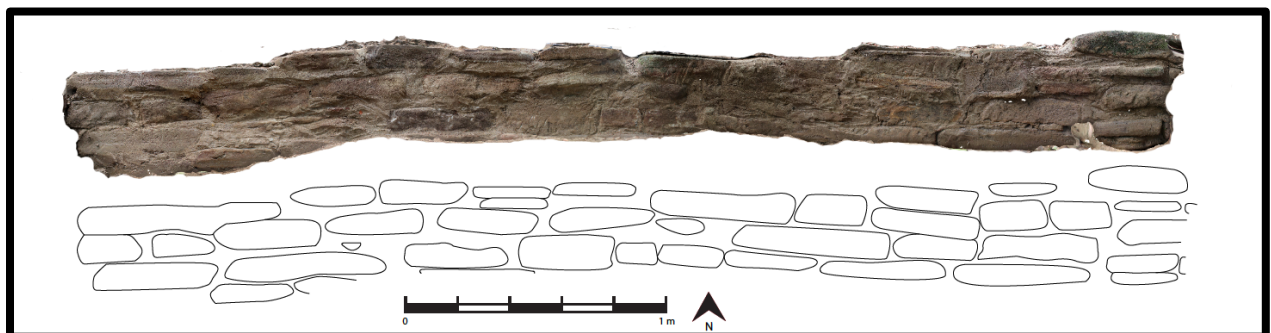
South-facing wall (F.6/32Y/1) of Structure 6 post-consolidation.
